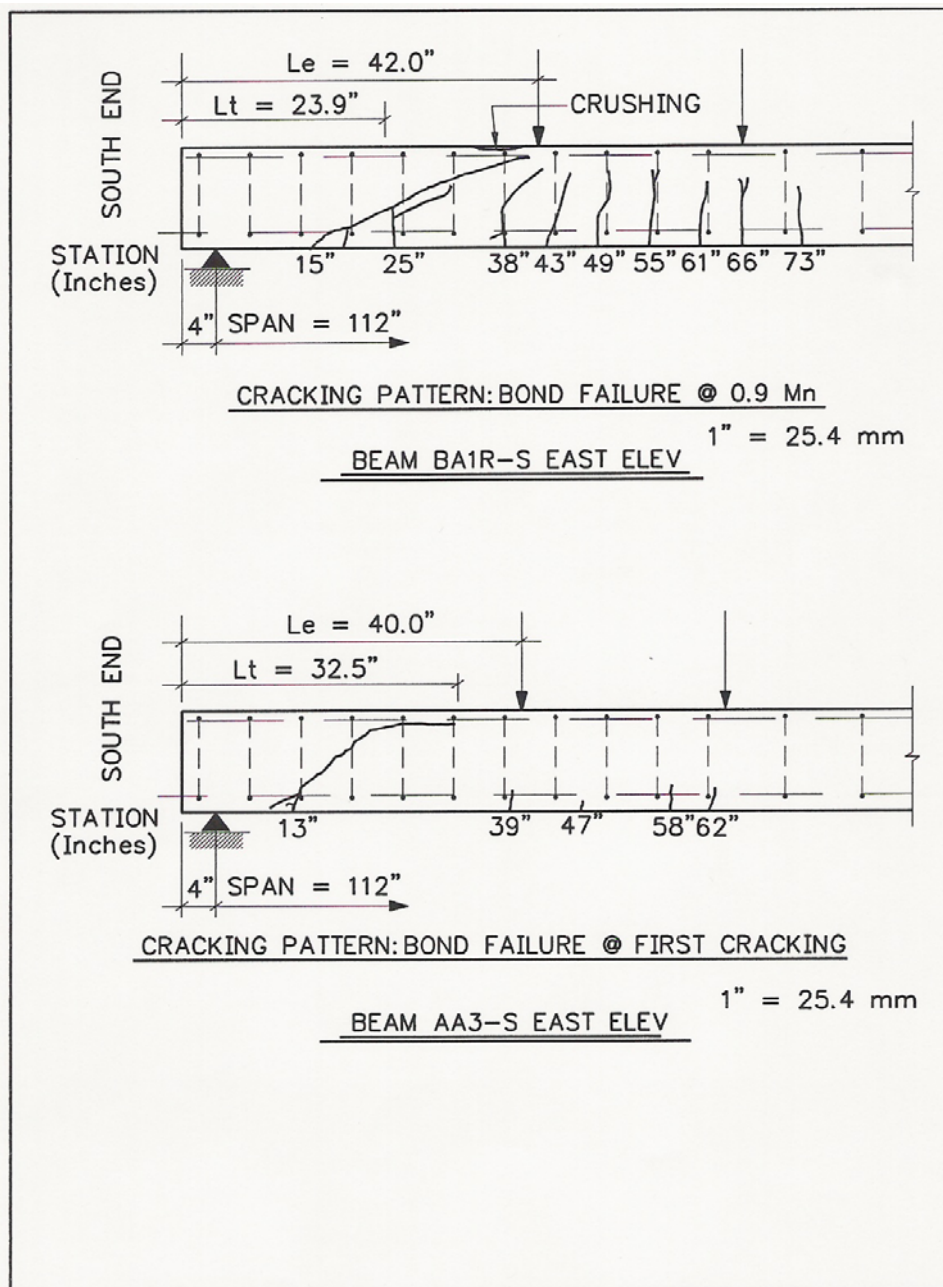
CRACKING PROGRESSION OF BOND FAILURE
